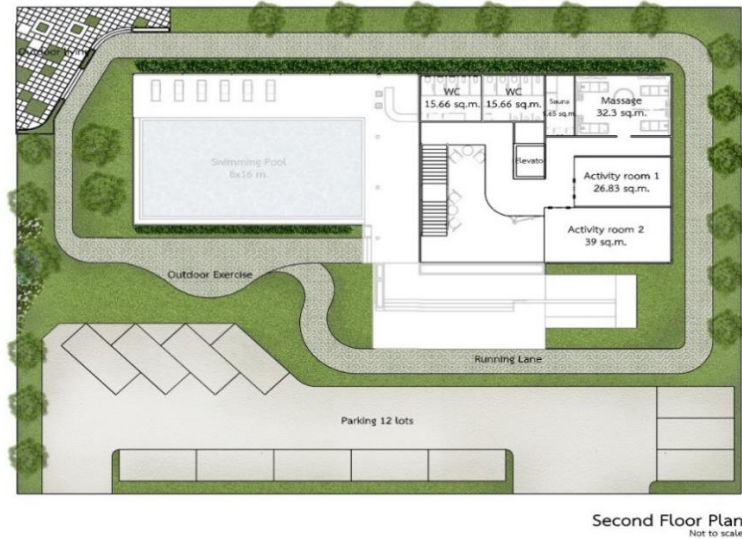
shows the model development of preventive health promoting center for elders: 2<sup>nd</sup> floor plan
